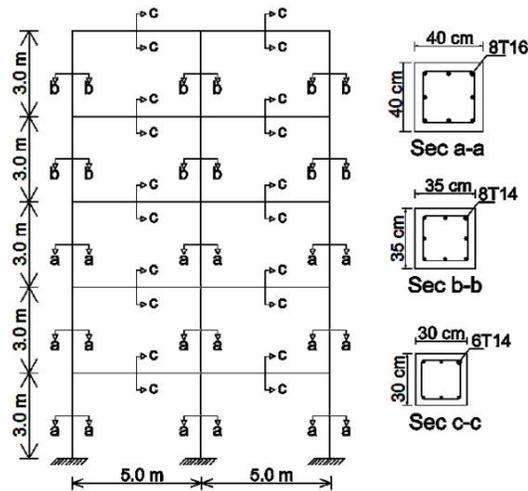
Typical 5-story RC Frame and the Sections of Beams and Columns.
